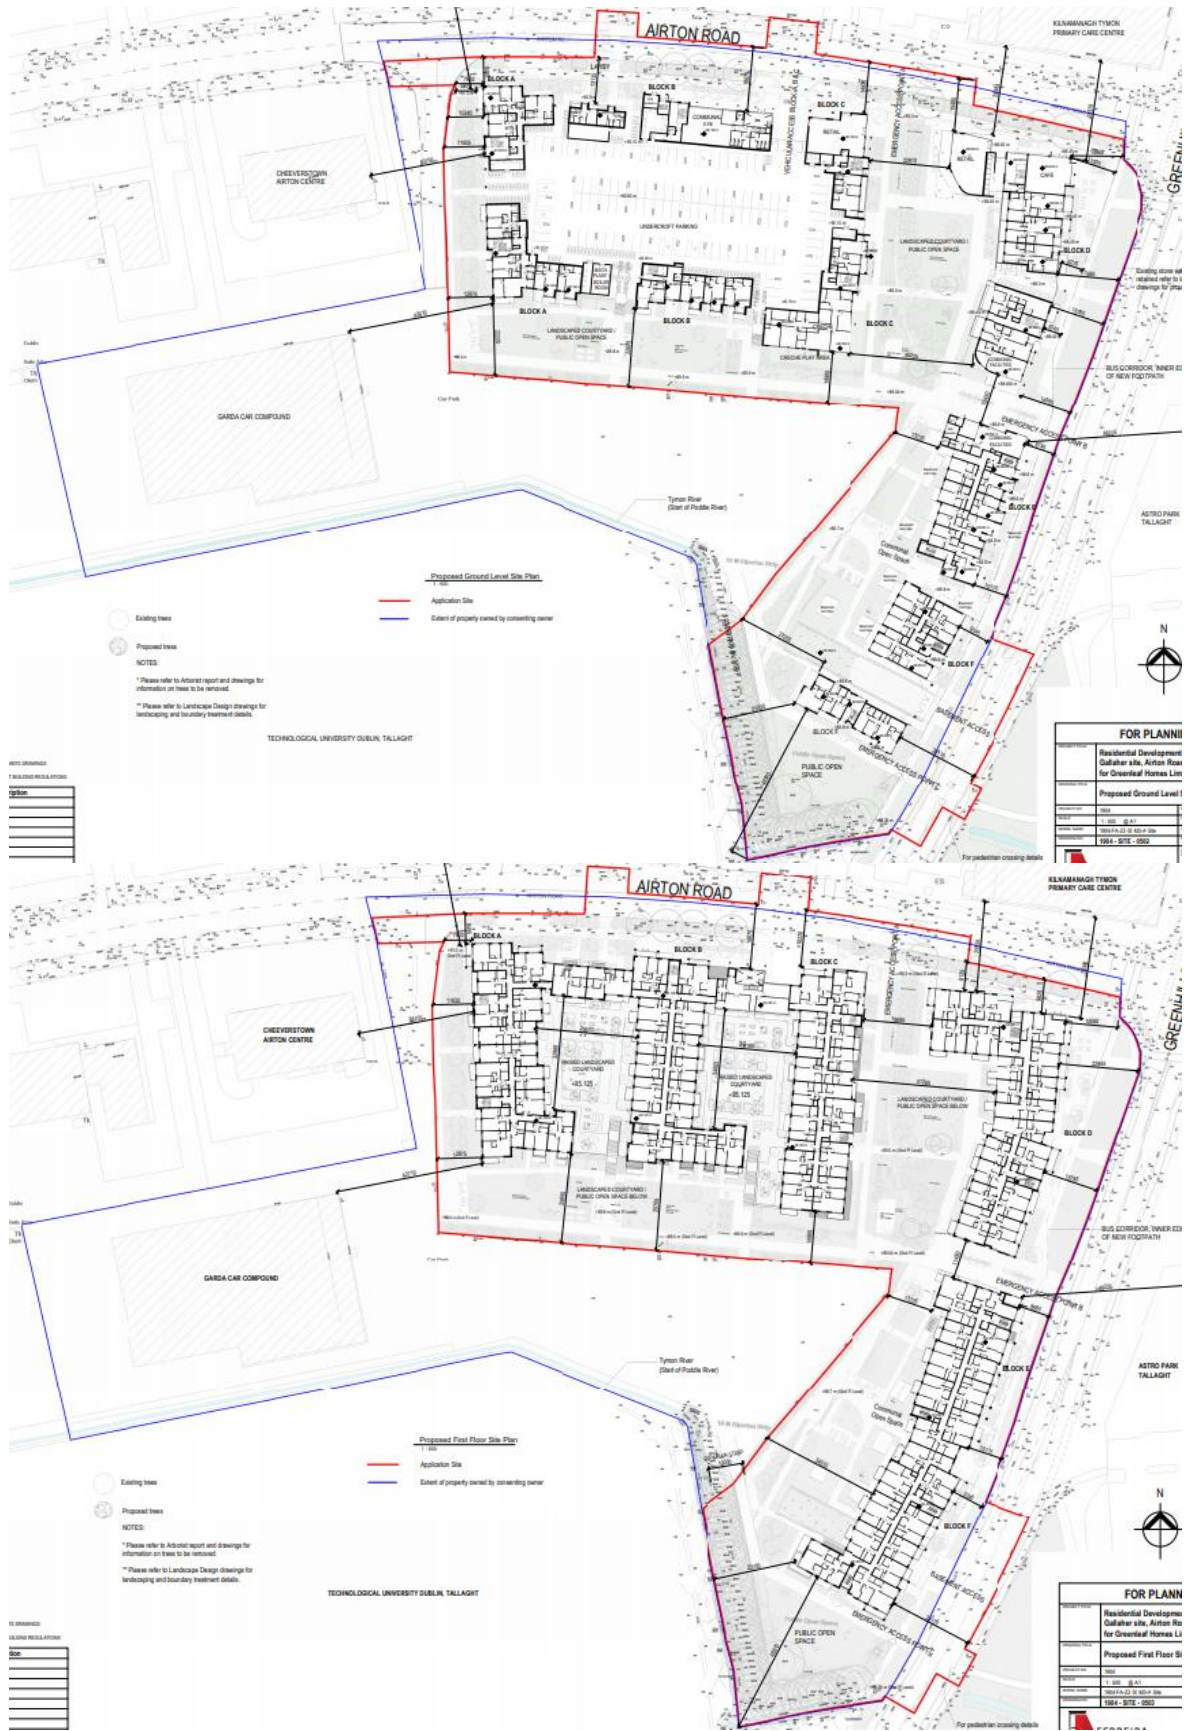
Ground floor layout plan (top) and first floor layout plan (bottom) of development approved under ABP Ref. ABP-306705-20.
